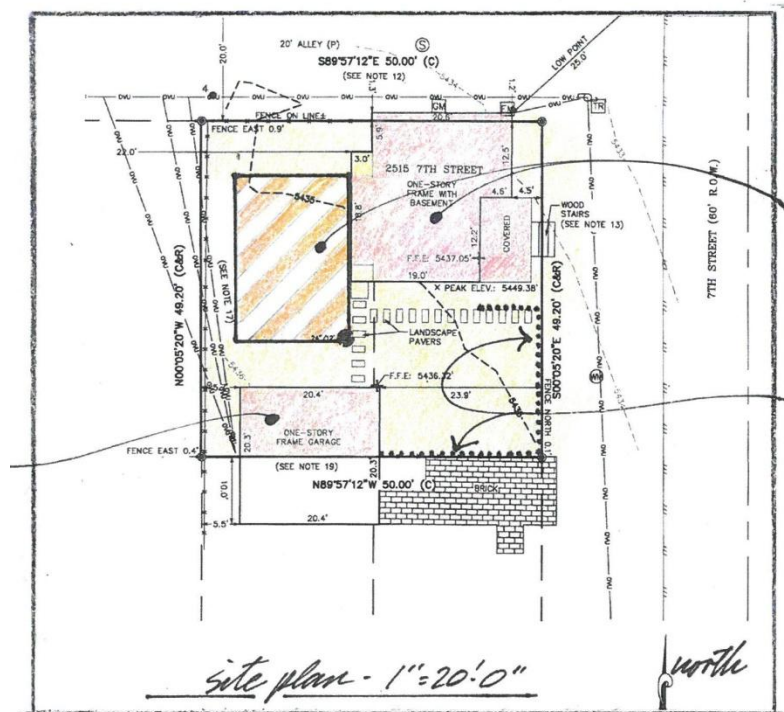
Site Plan. Shaded portion indicates footprint of approved addition.
